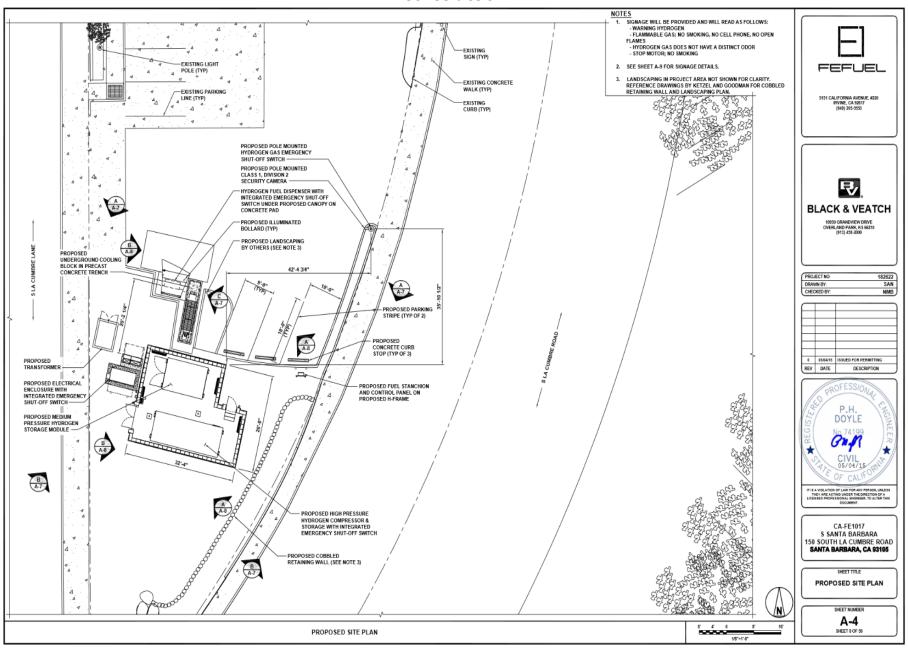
Detail of Equipment Compound from CD100 Drawing Set Showing Complete Detail for Permitting and Construction
